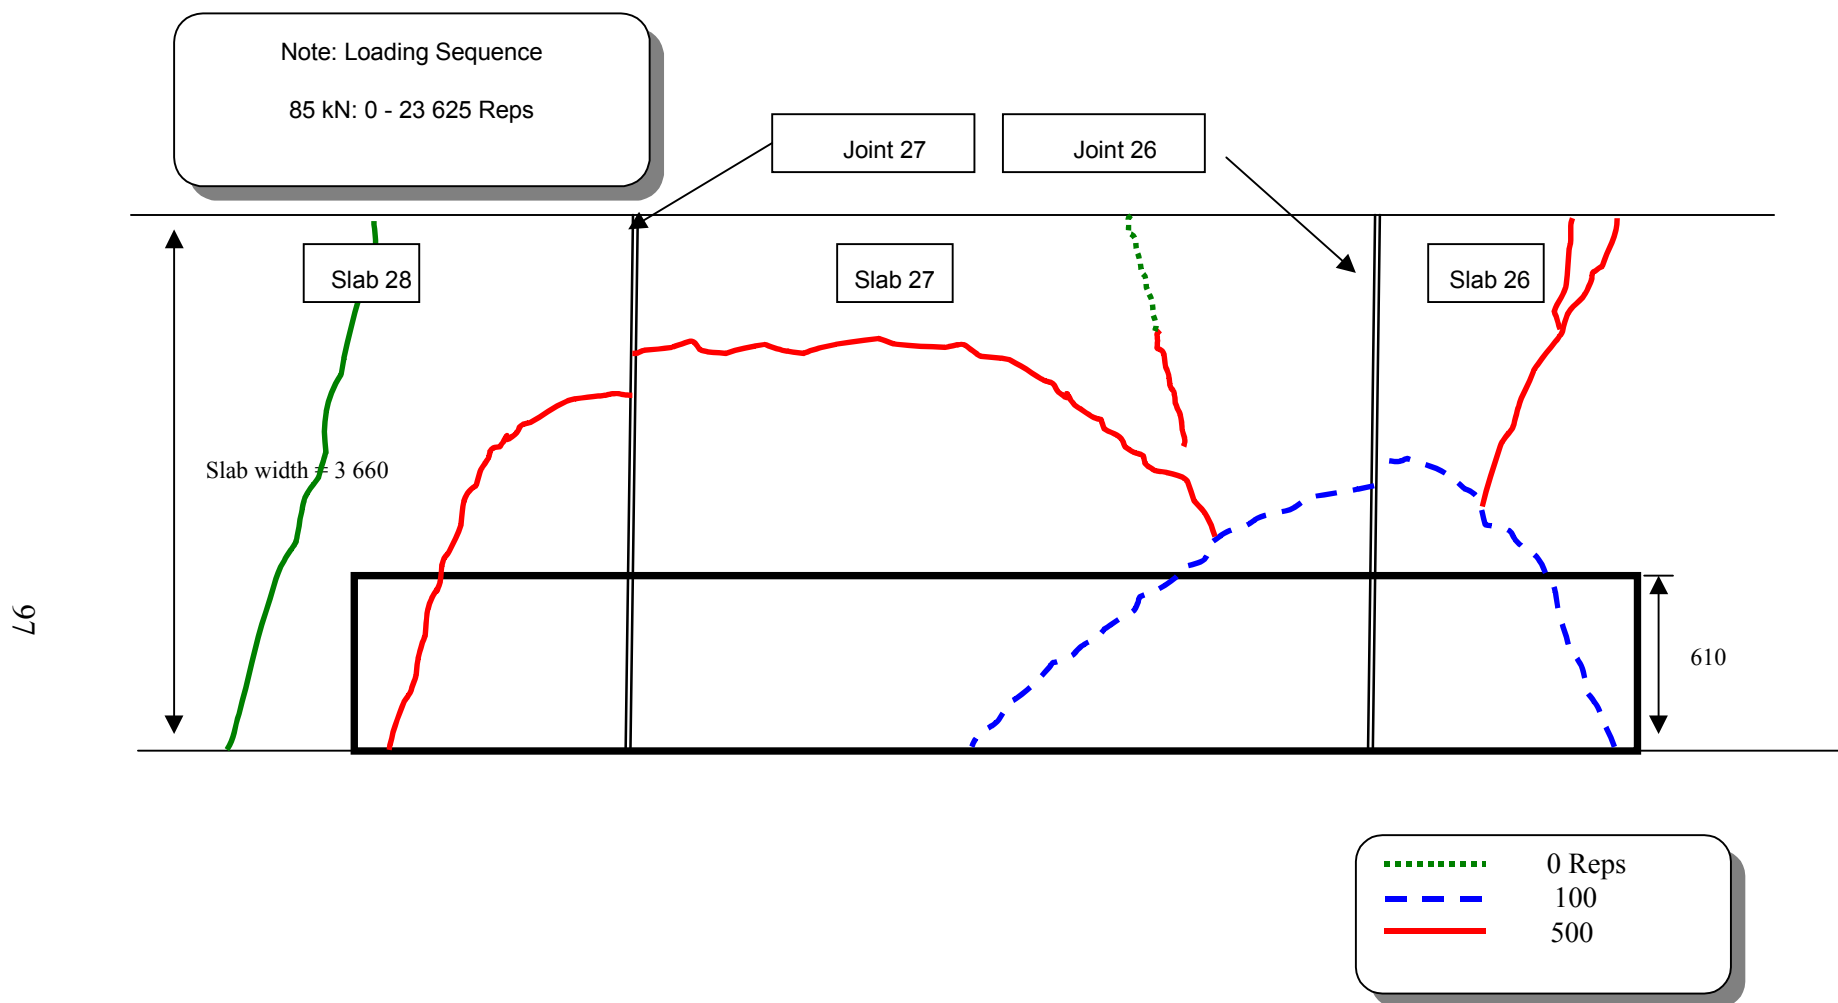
Schematic of crack development, Test Section 526FD (not to scale).
